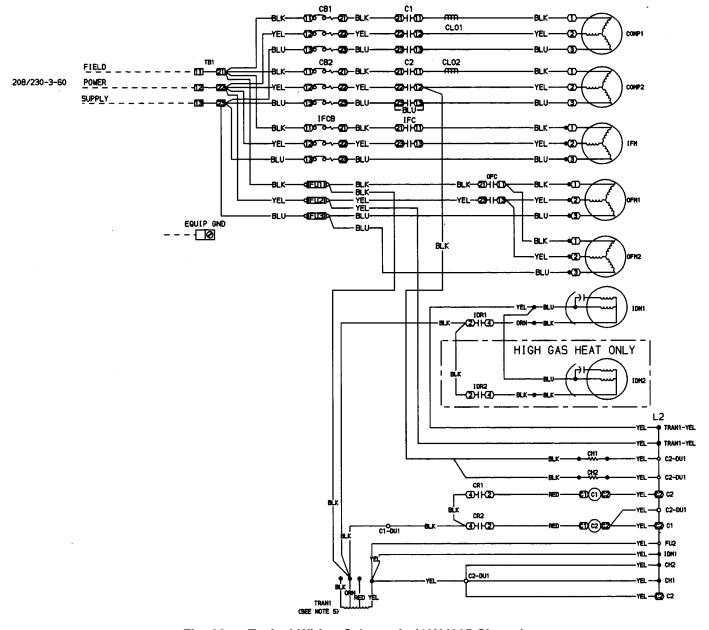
Typical Wiring Schematic (48HJ025 Shown)
